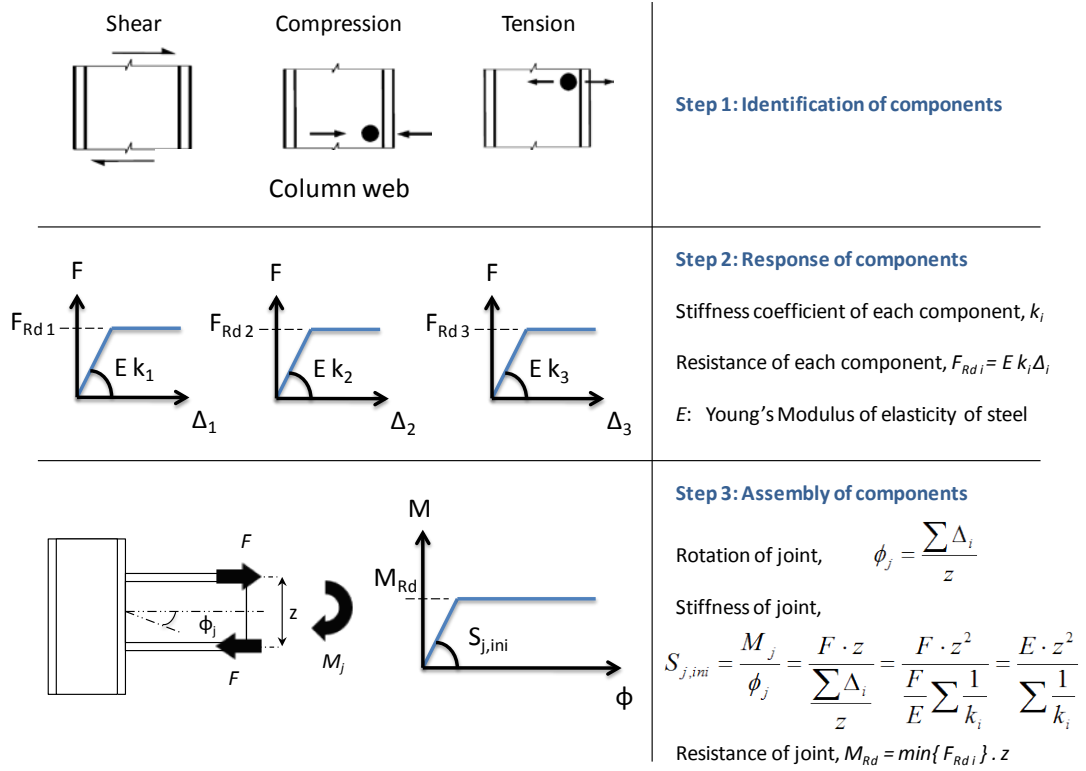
Component method for welded connection (bi-linear approach)
